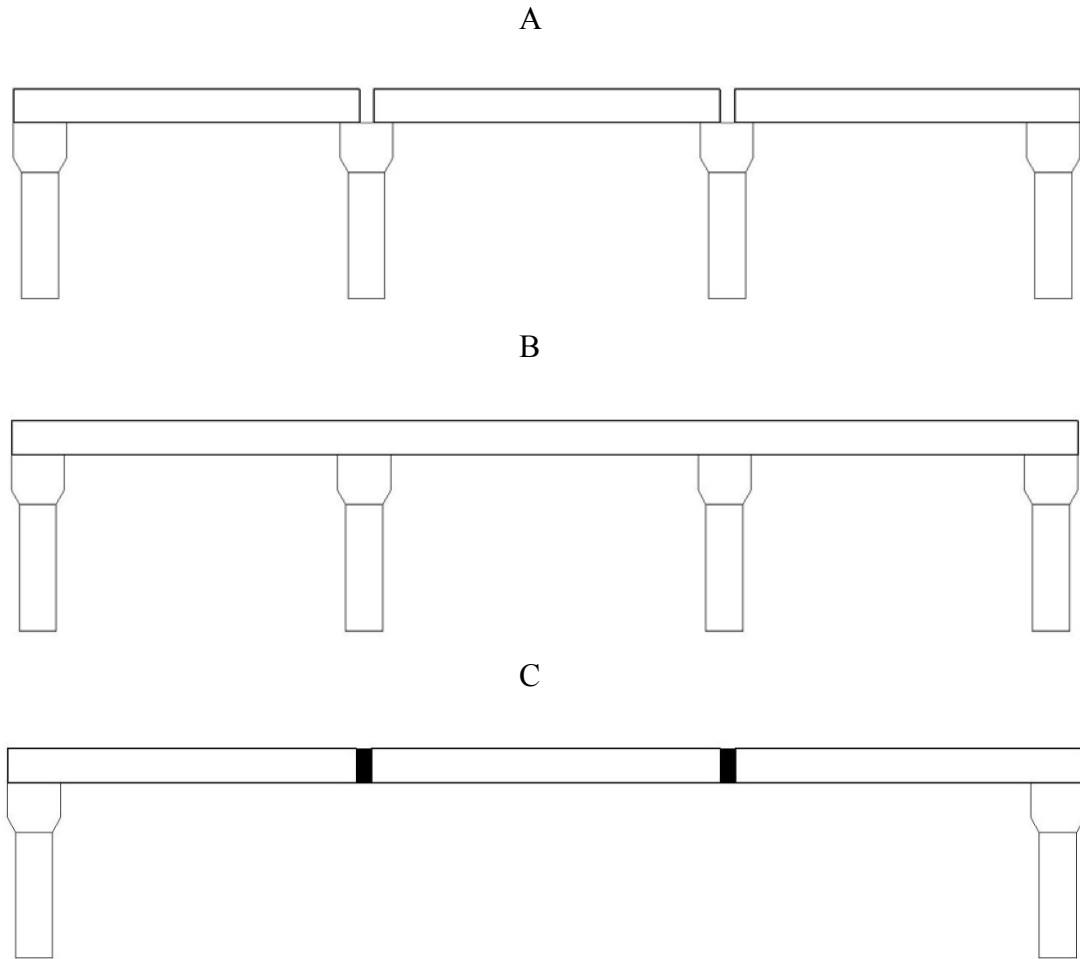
16 Common pile-support setups for bridge superstructures. A) simple, B) continuous, C) linked.
